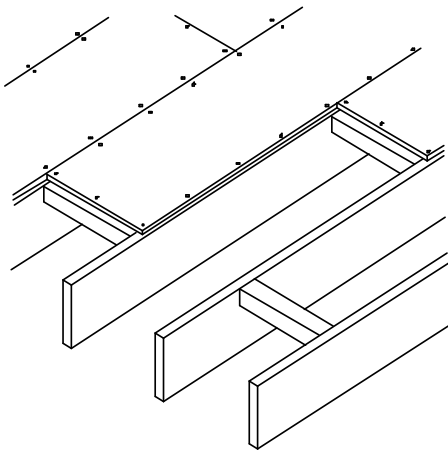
Square edge structural decking (except OSB) laid parallel to the joists and supported at all edges
